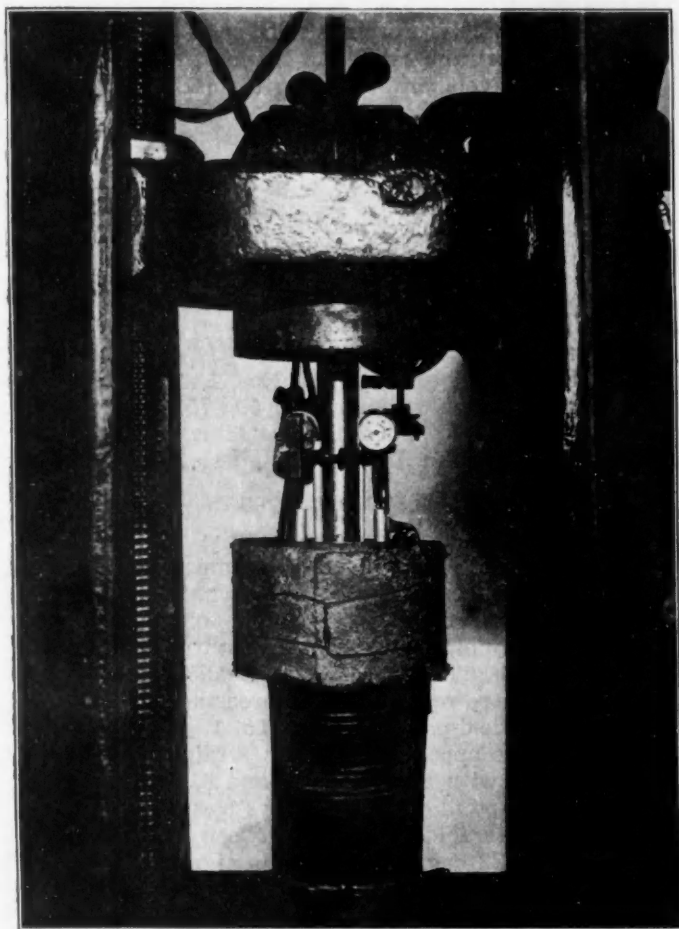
THE ENTIRE TESTING APPARATUS IN PLACE
